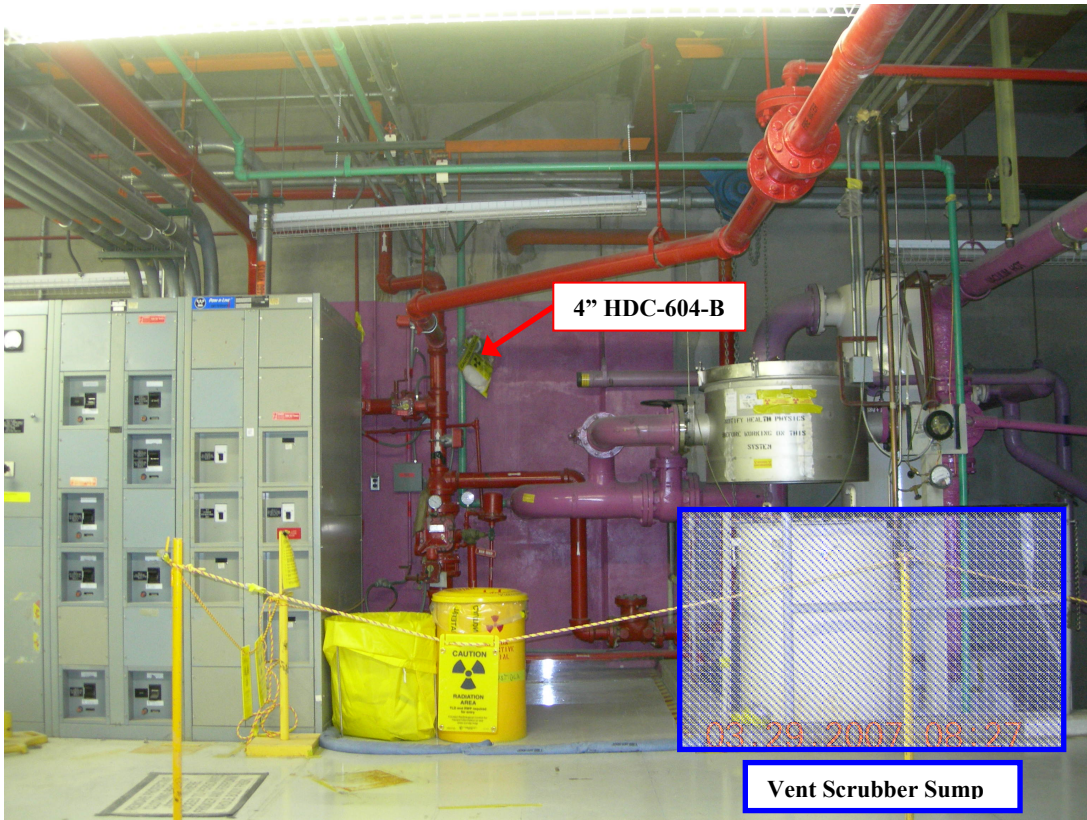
The south wall in TRA-604 basement located under the 4" HDC-604-B drain pipe.
